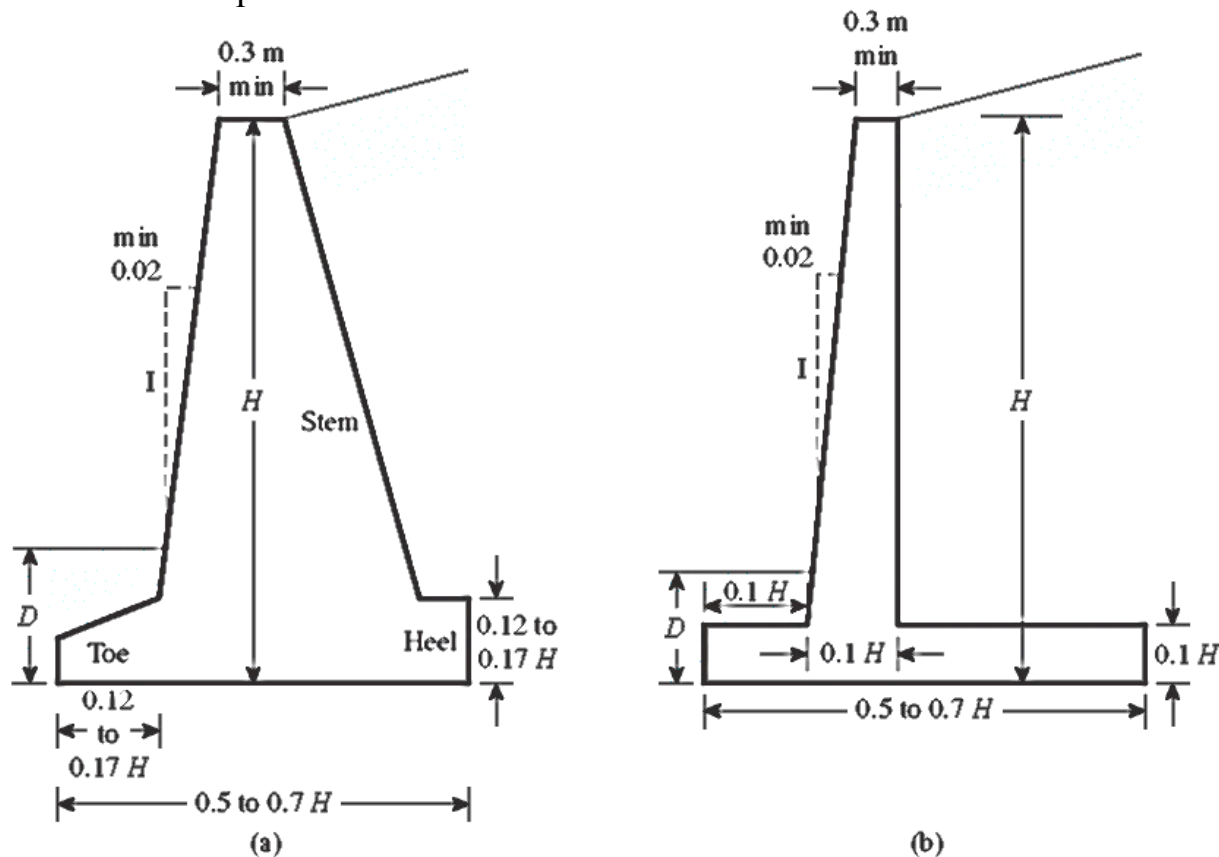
Approximate dimensions for various components of retaining wall for initial stability checks: (a) gravity wall; (b) cantilever wall.
